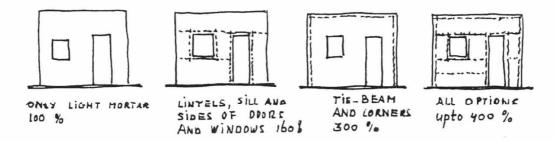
INCREMENTAL STRENGTH OF WALL SECTIONS WITH HORIZONTAL AND VERTICAL REINFORCEMENT
